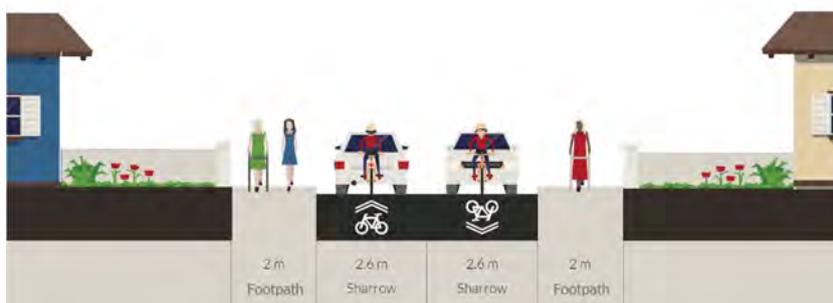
Route 5A, 5B, & 5C Cross Section B-B Proposed
